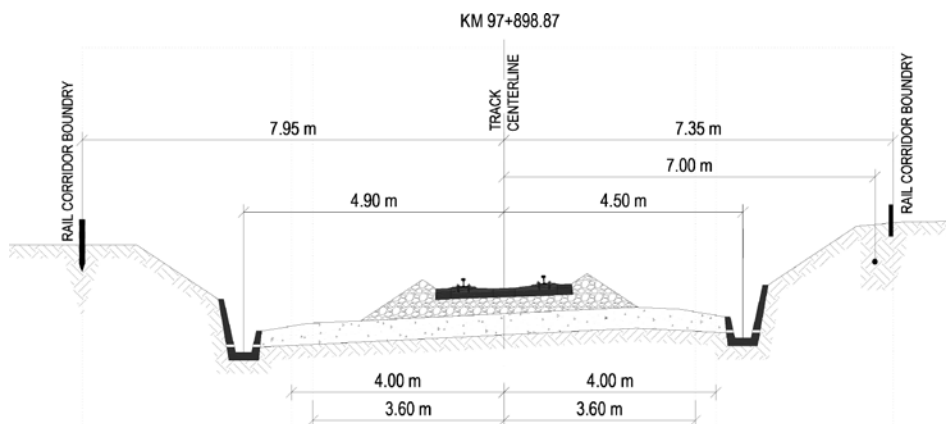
Typical cross-section of Lika railway from Perušić to Gračac
